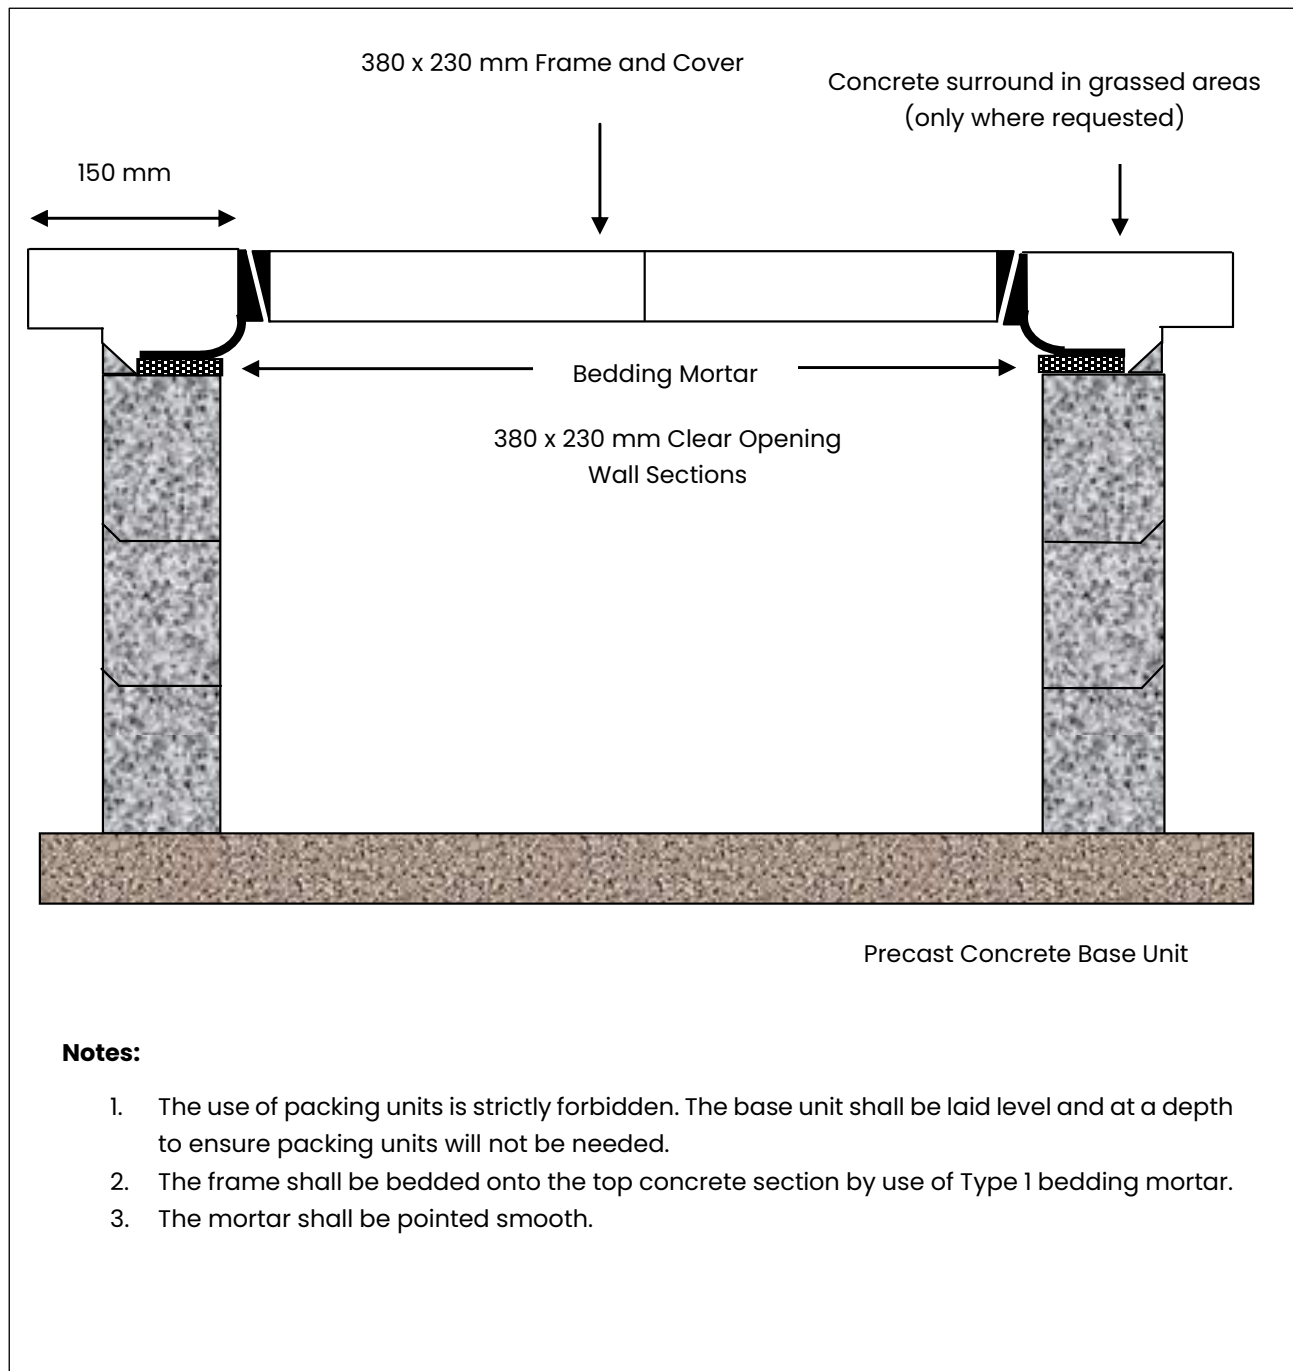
Precast Concrete Chamber with a 380 x 230 mm Frame and Cover
